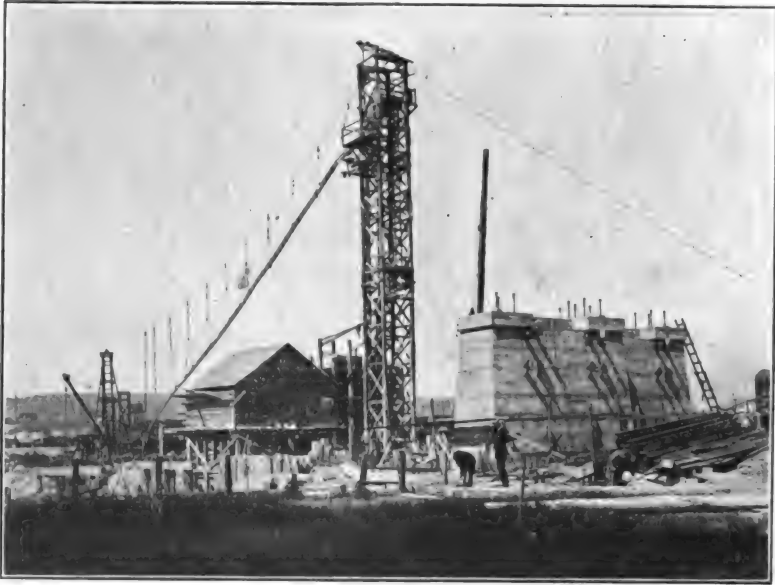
SALMON BAY PIERS, N. P. RY.
